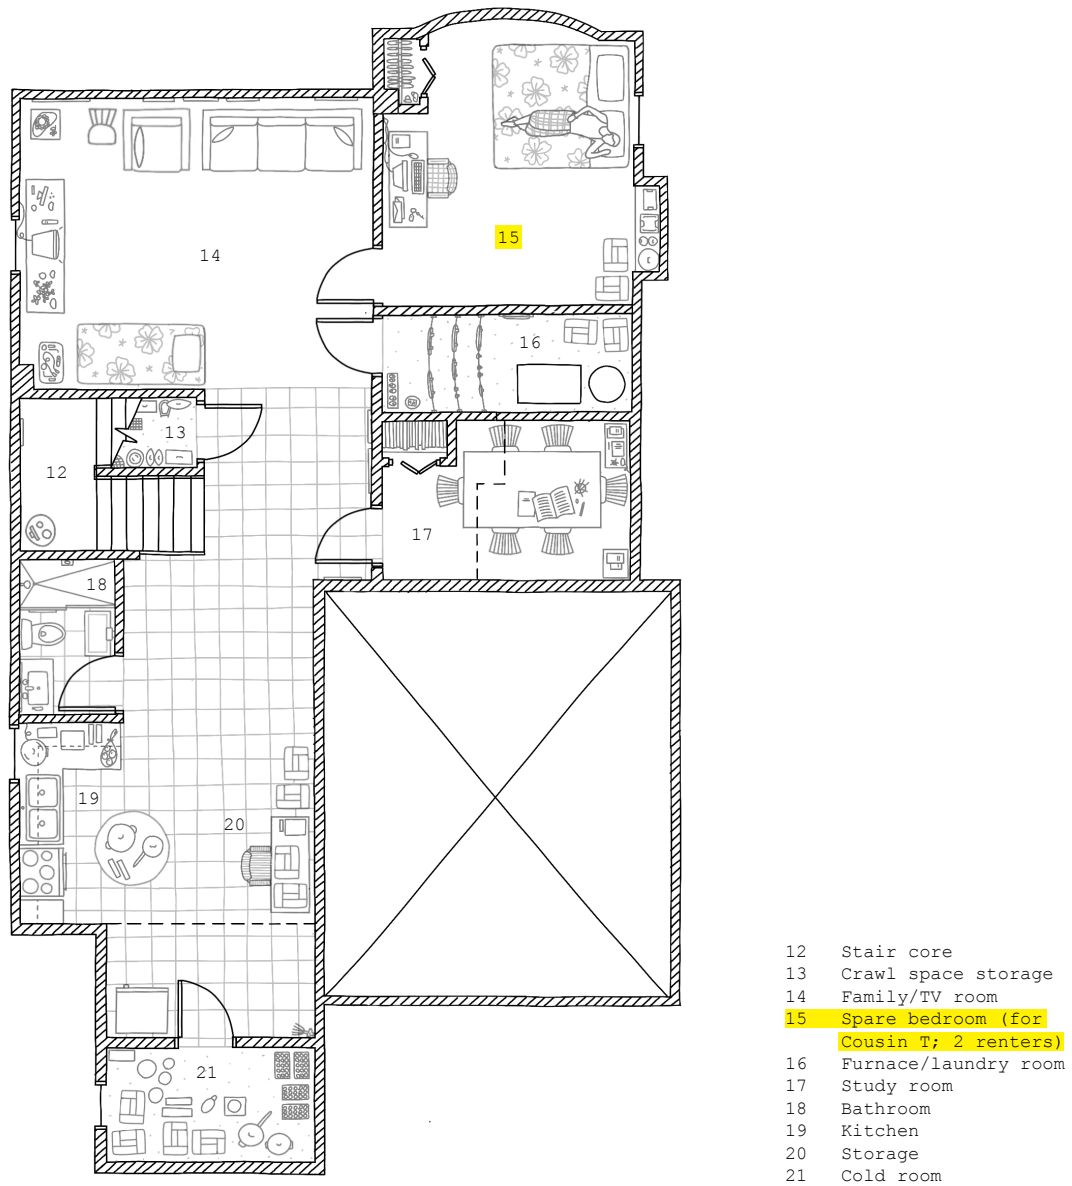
Basement plan of the Milton house highlighting how bedrooms were occupied from 2001-2019.
